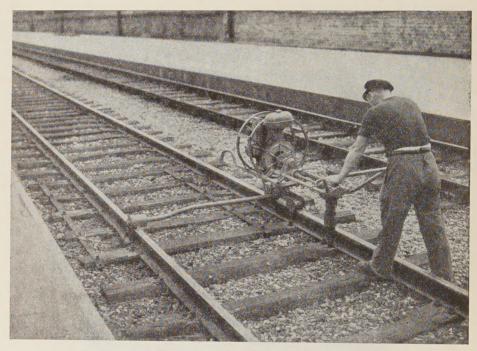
« Pouget » wood screw driver with « Briban » motor.
